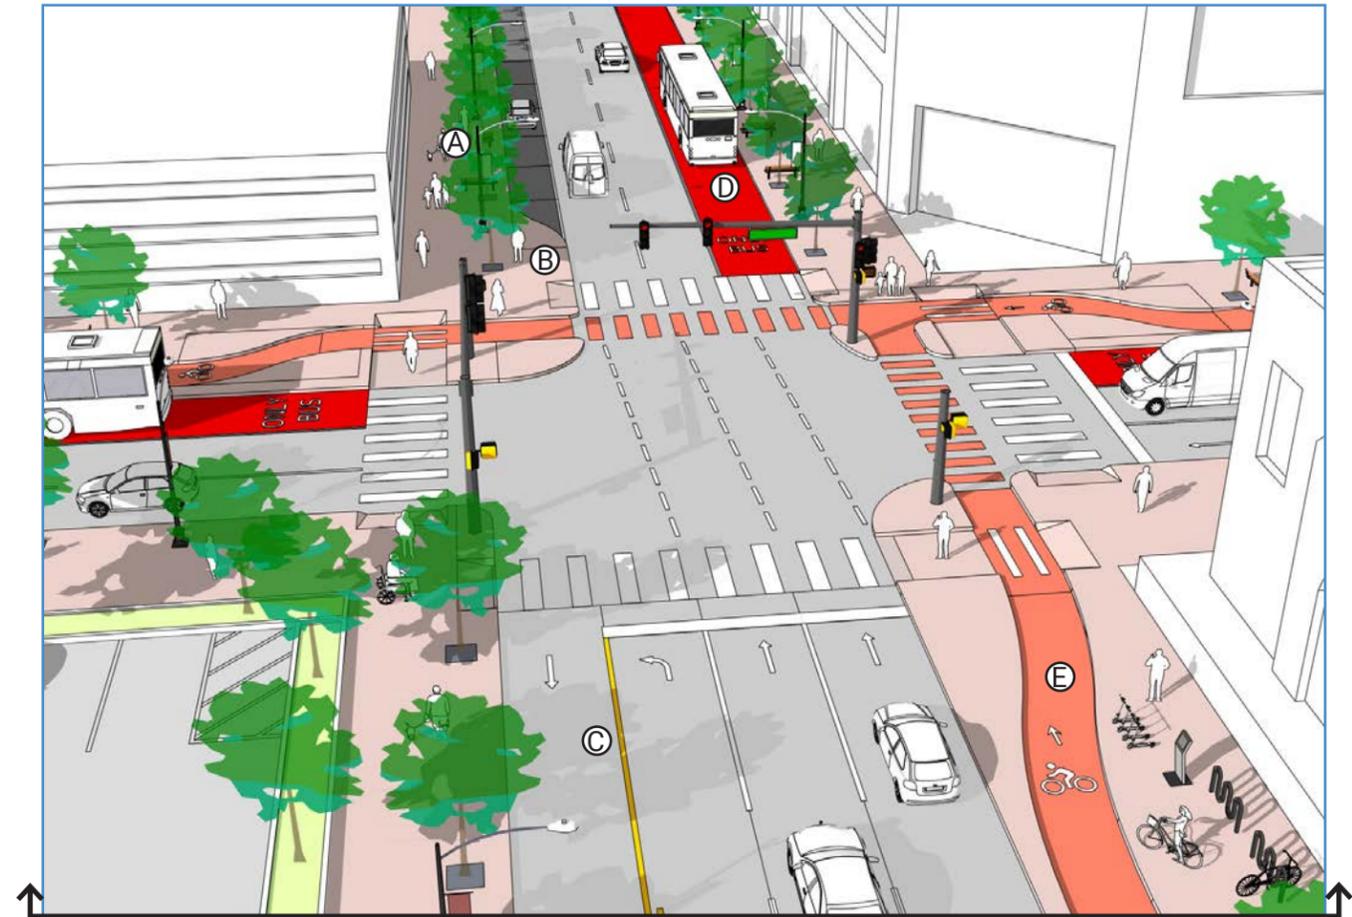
Seventh Street Looking West at San Jacinto Boulevard
